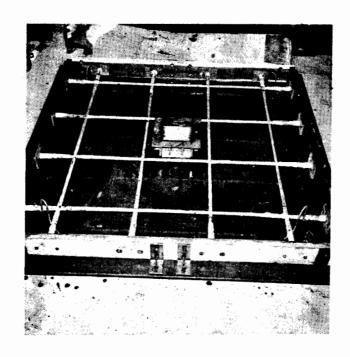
LAYOUT OF SPECIAL REINFORCED CONCRETE SLAB
